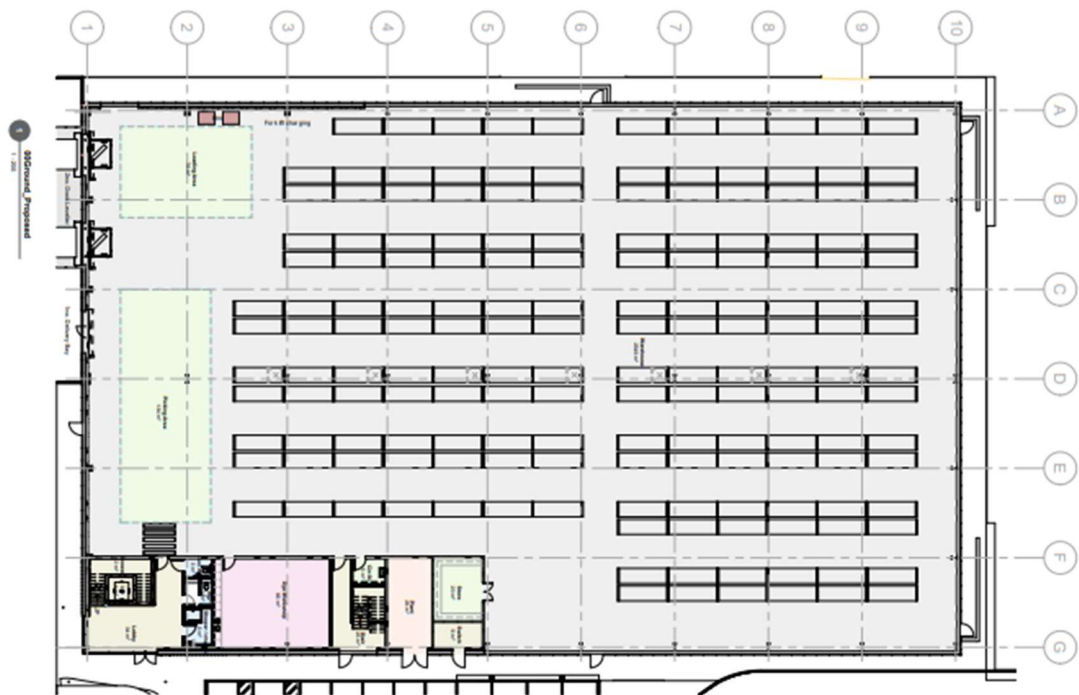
Proposed Ground Floor Plan [source: Cassidy + Ashton]
